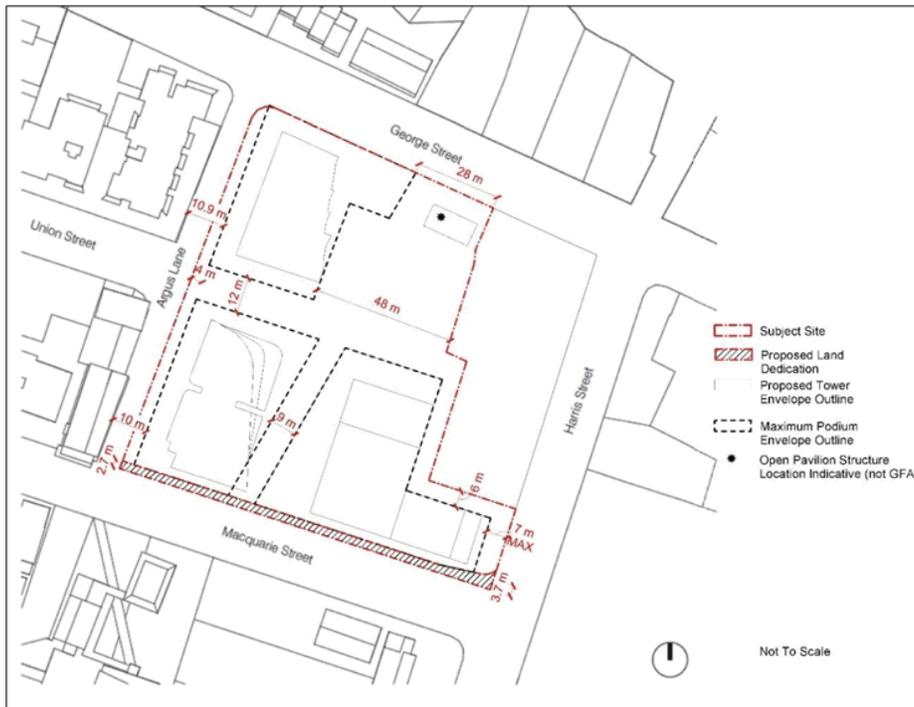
Control diagram: Setbacks and separations at street level
